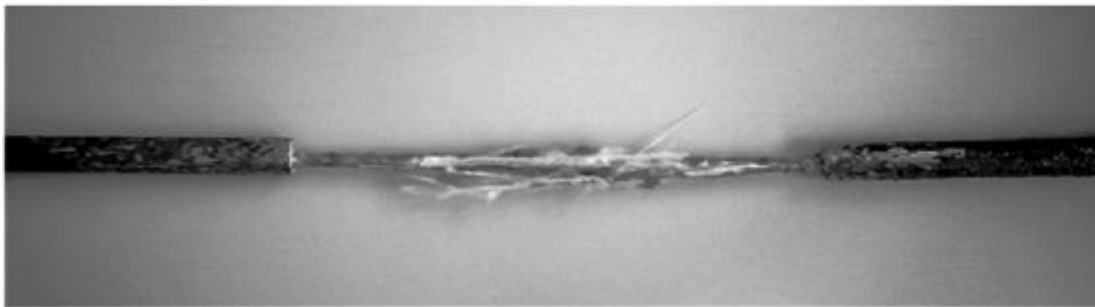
Typical Failure mode of Tested Rebars
